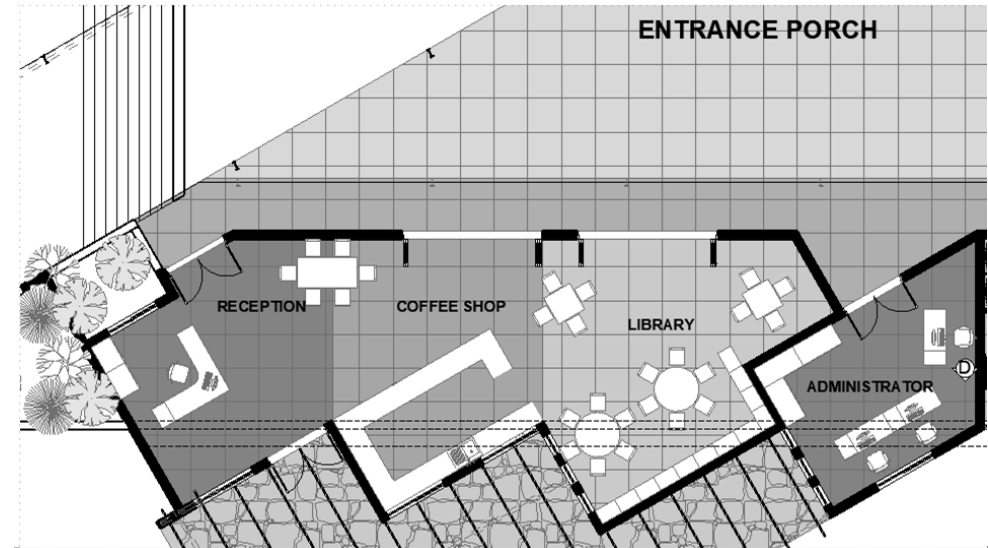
Open plan as a flexible layout of spaces (Author 2022).
